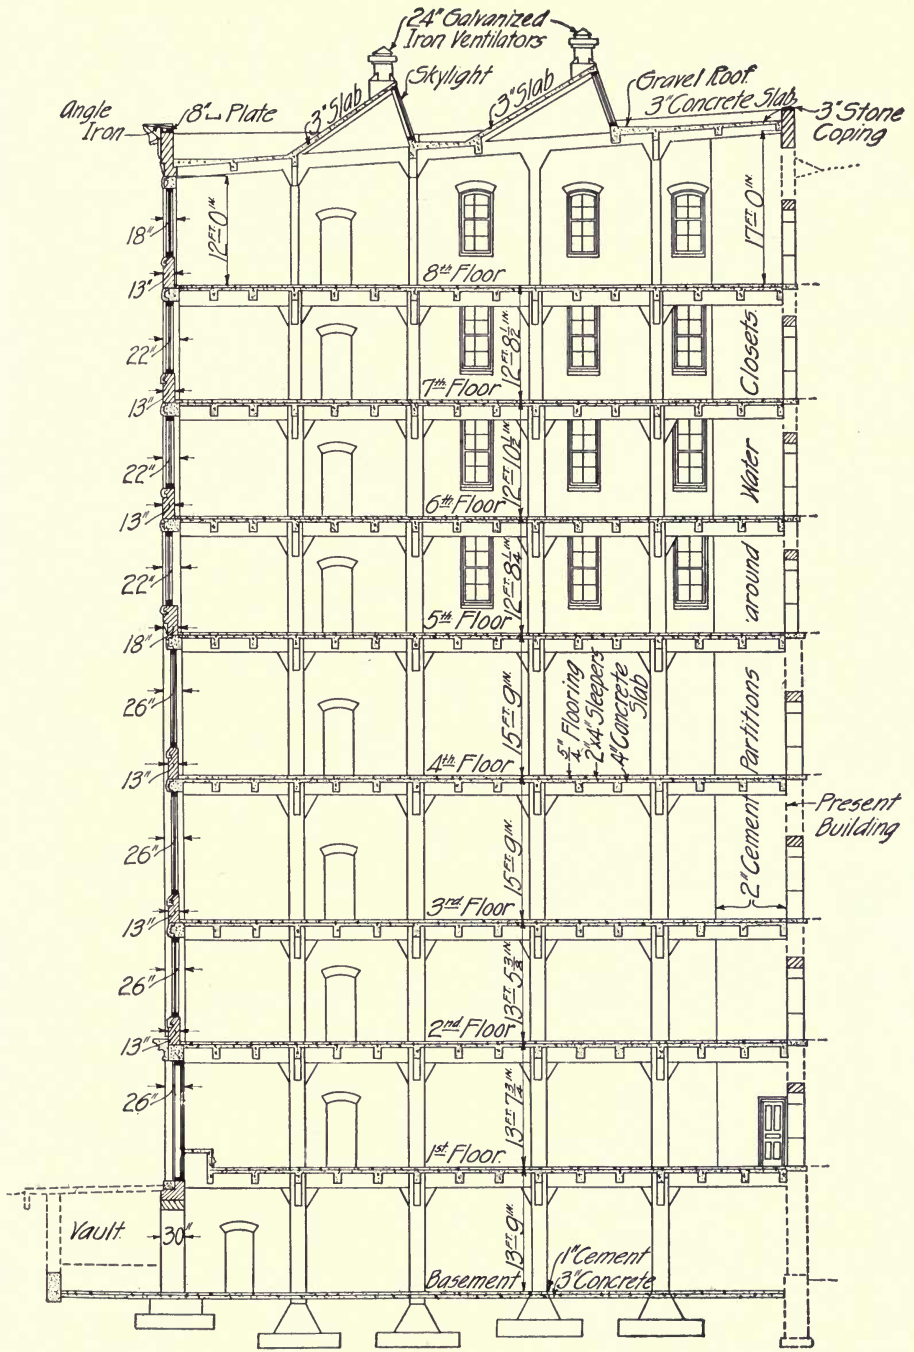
Cross-Section of Ketterlinus Building. (See p. 62.)
